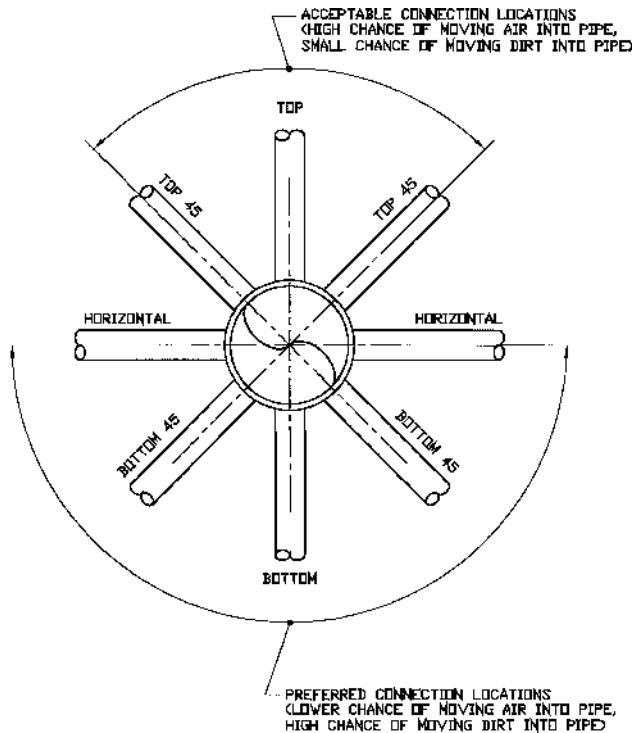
HYDRONIC PIPING CONNECTIONS.
